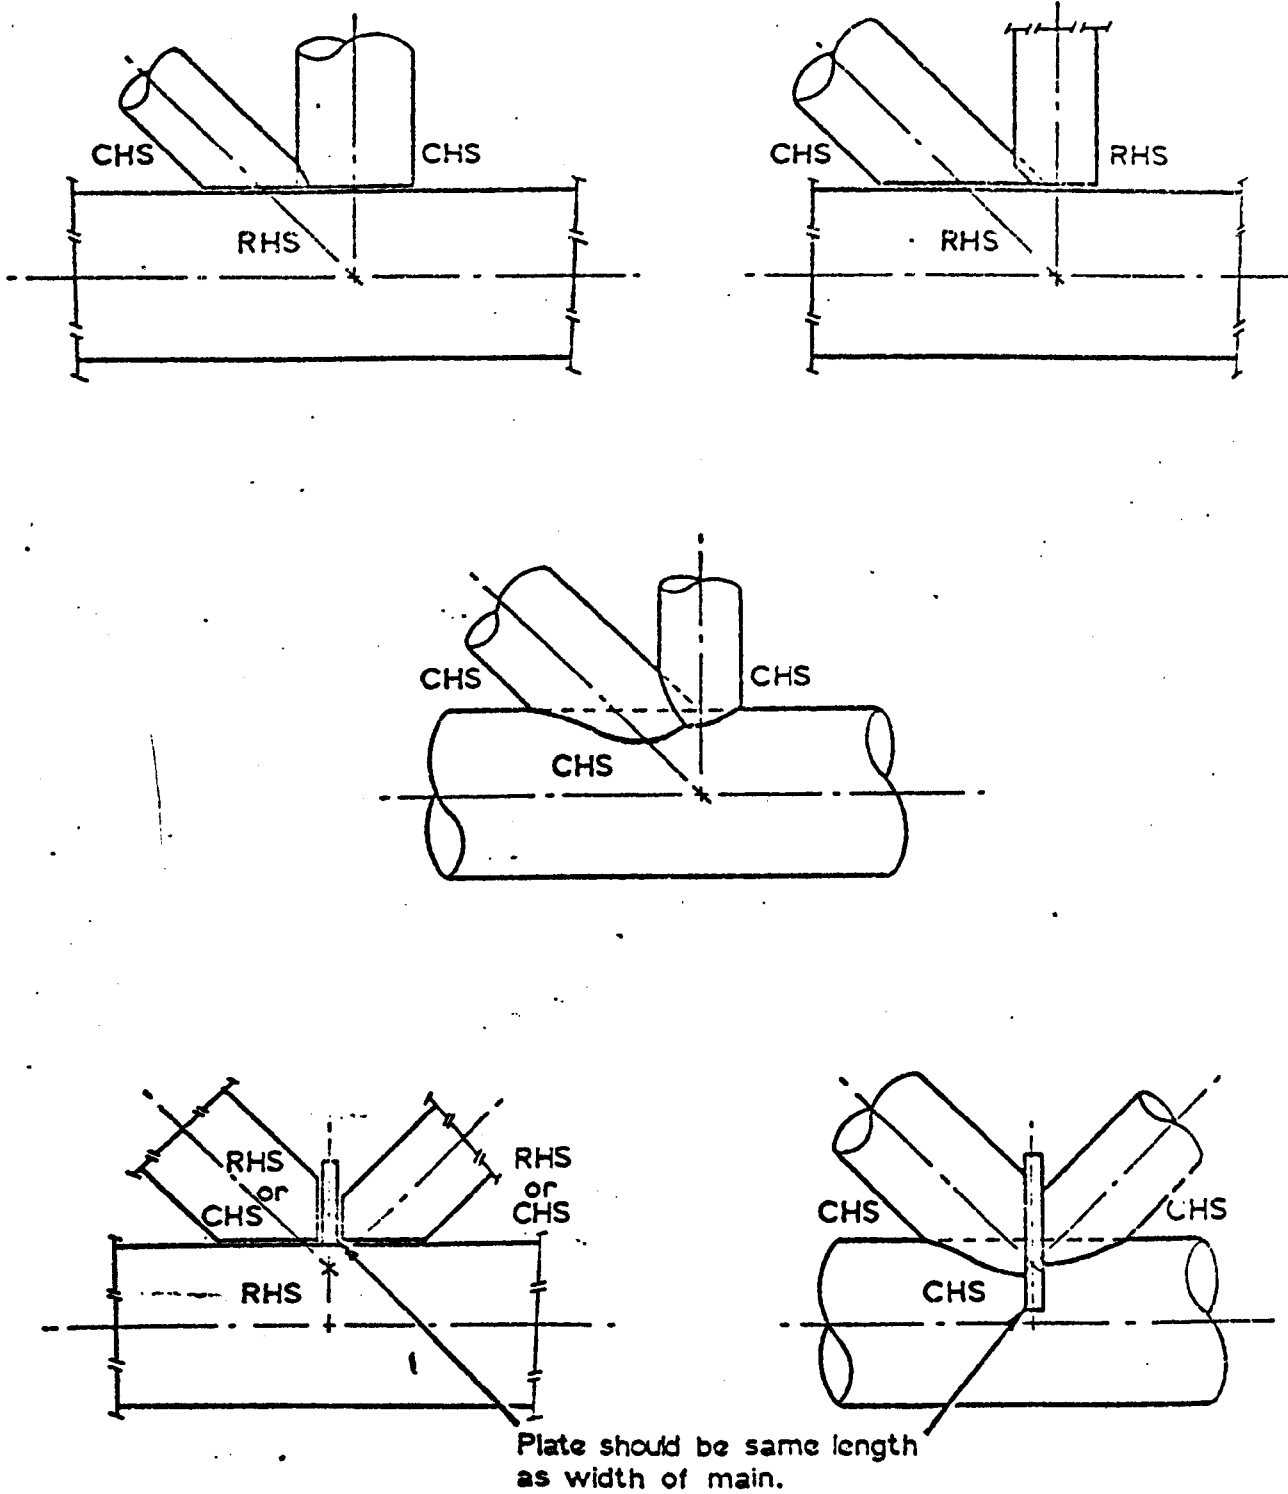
Welding Conditions for Joints in HSS - Using Joint Plates
